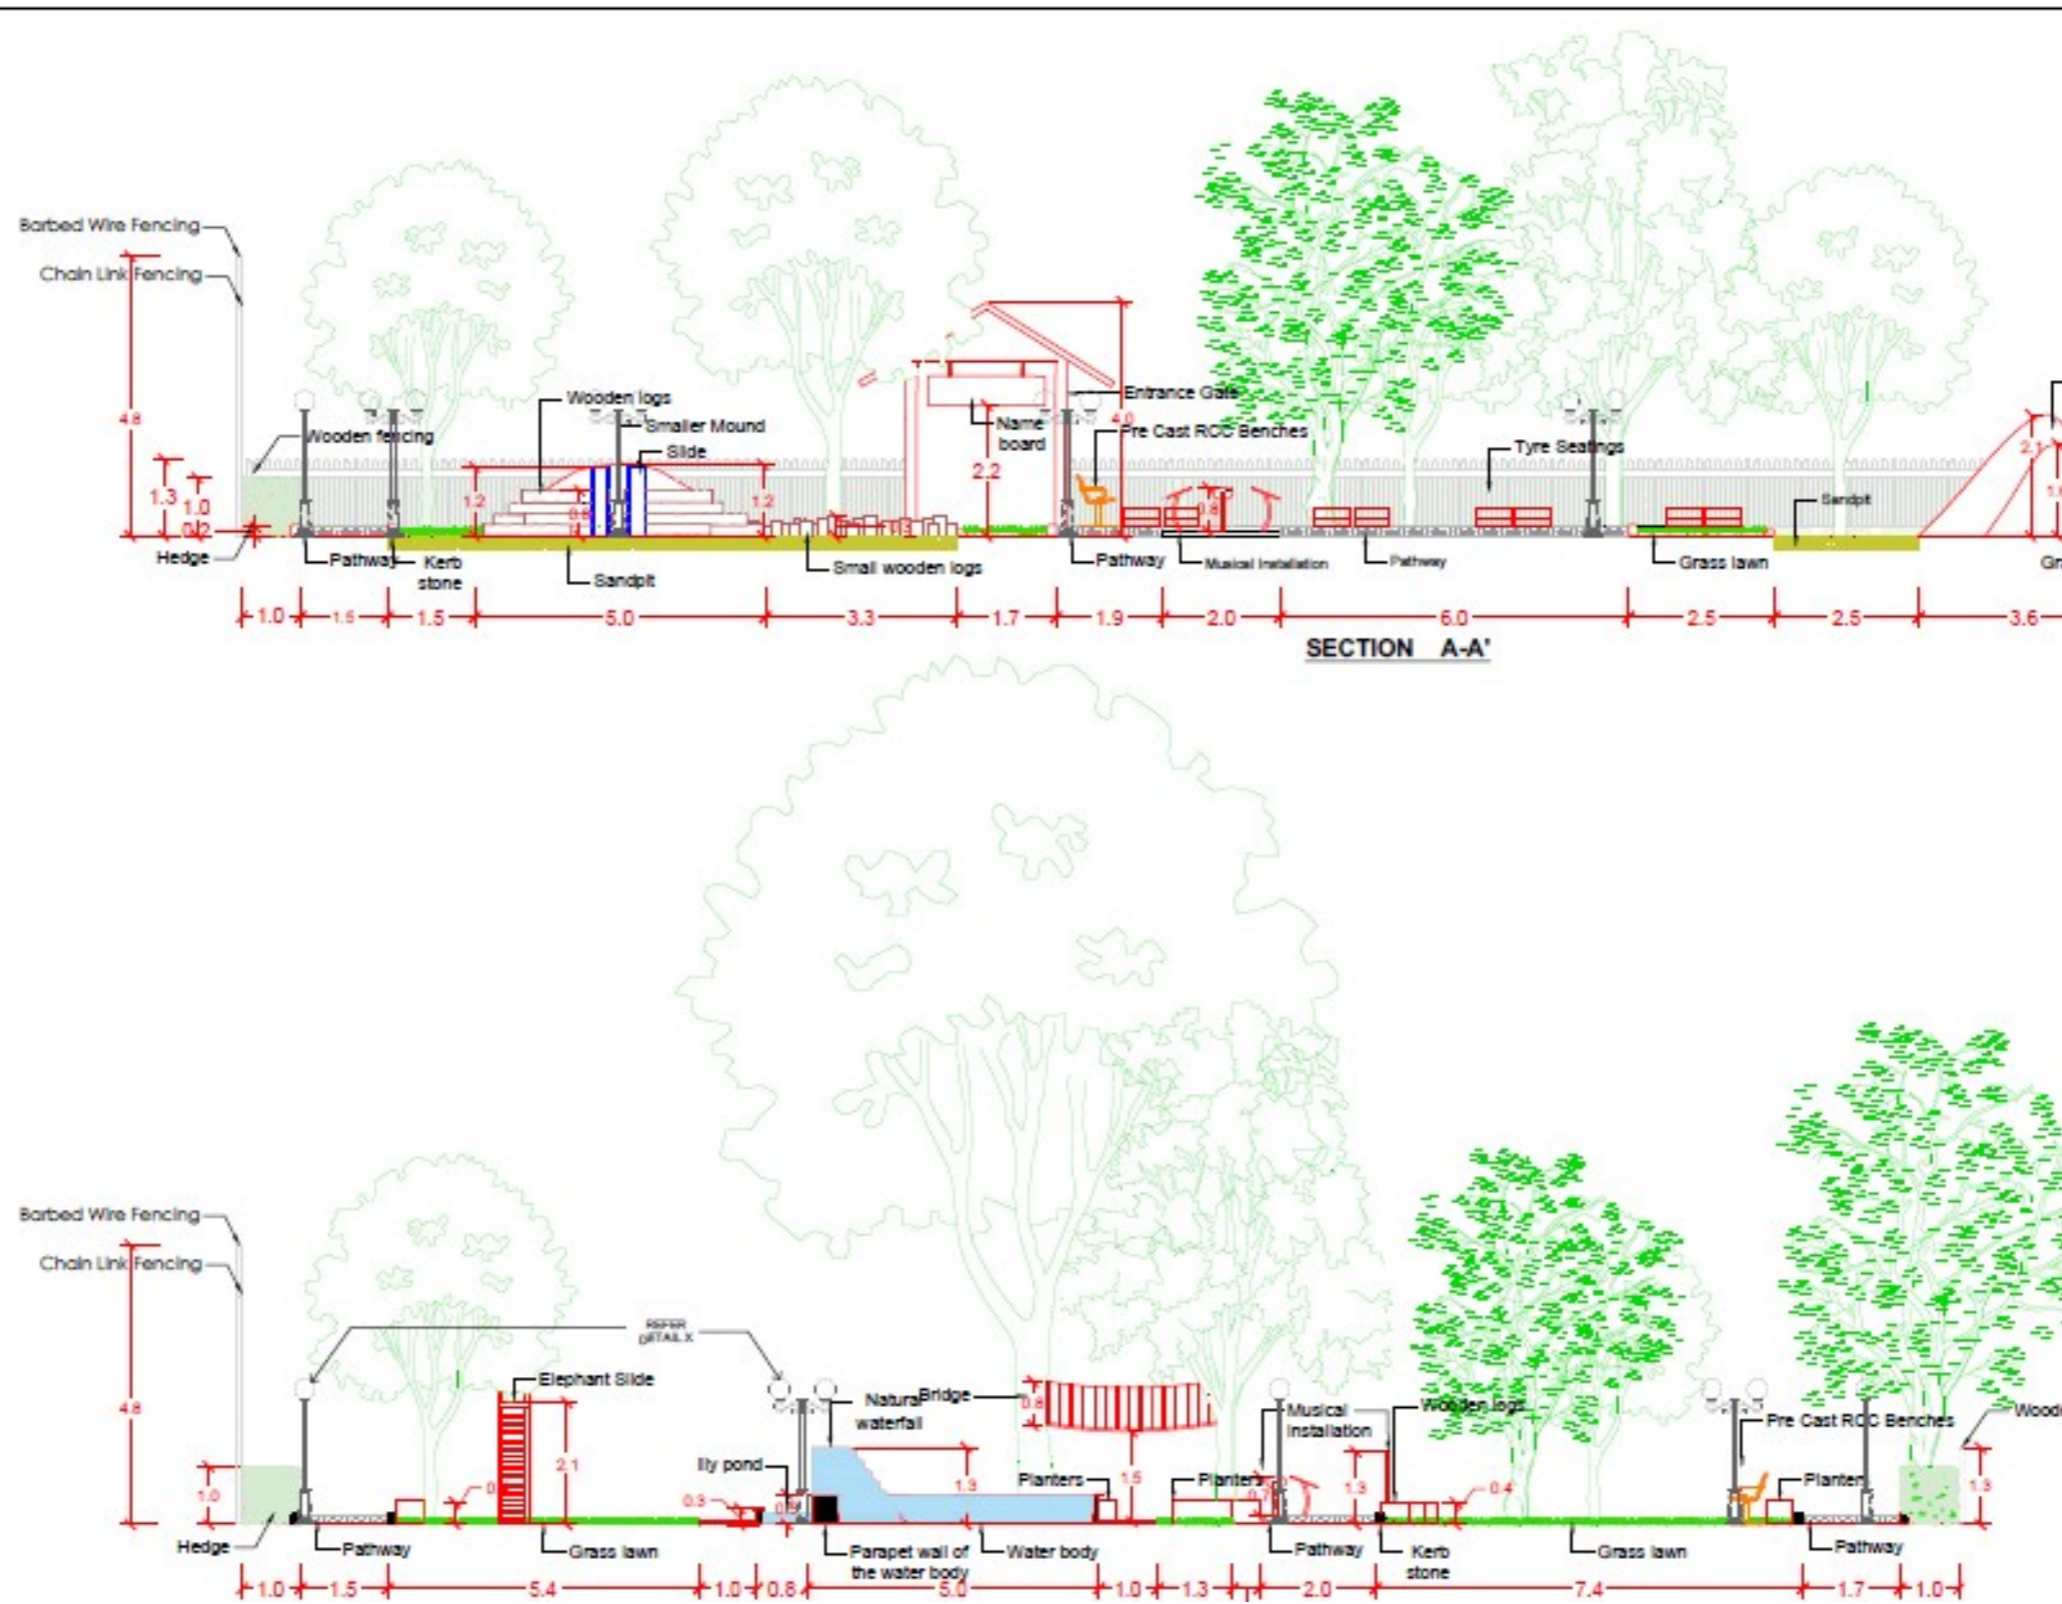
Section AA'- Highlighting Entrance Gate & Fencing, Mounds of Engagement Zone 1, 2 and 4 and BB'- Highlighting Water Play Area & Wooden Deck & Hanging Bridge
